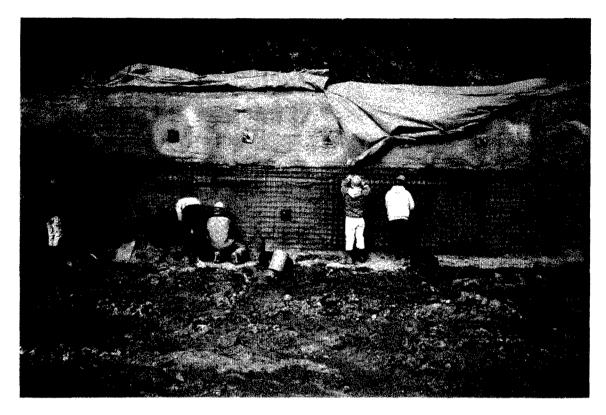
Steel placement prior to second stage Shotcrete layer at facing.
